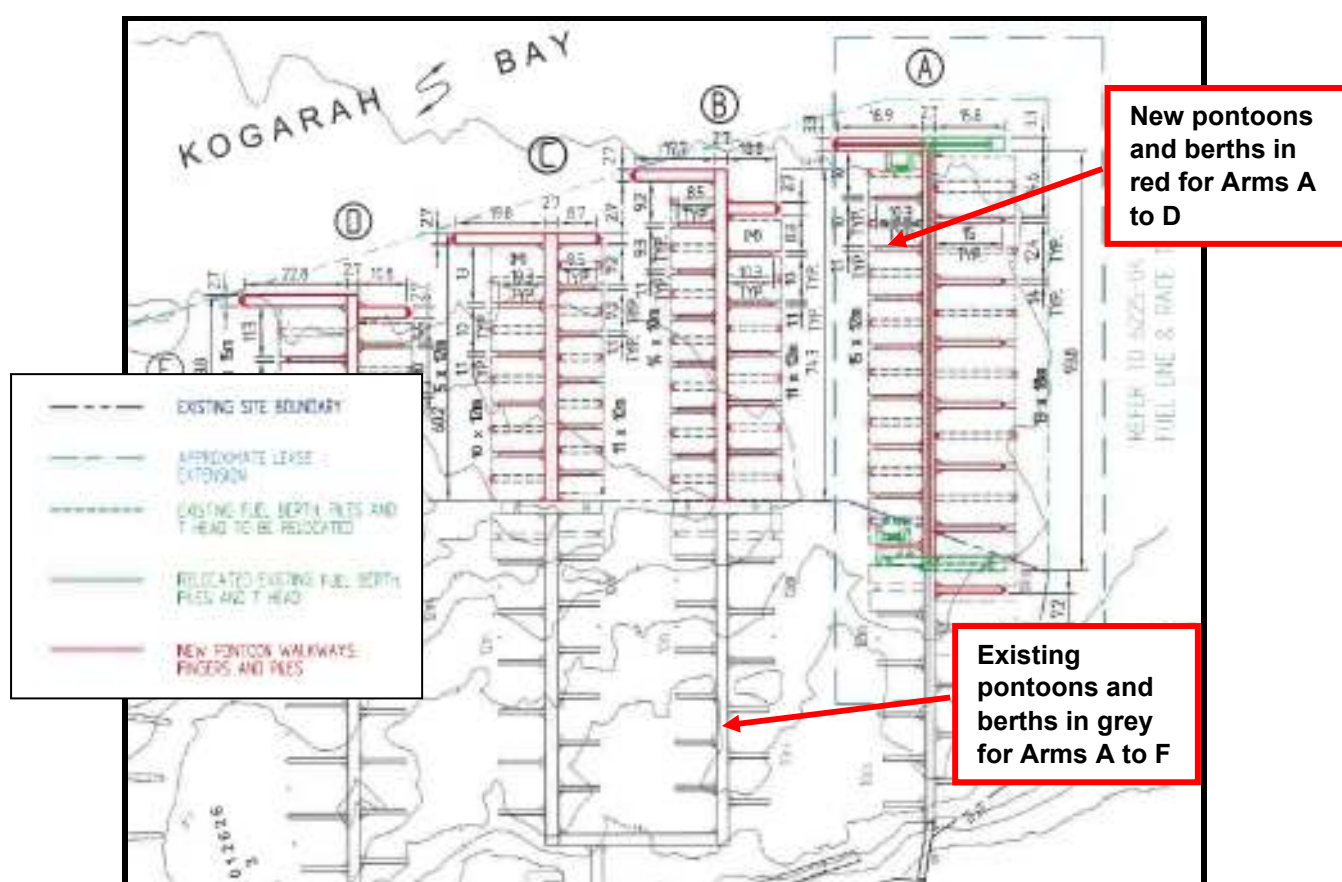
Proposed extension to berthing arms (Source: International Marina Consultants, March 2023)
